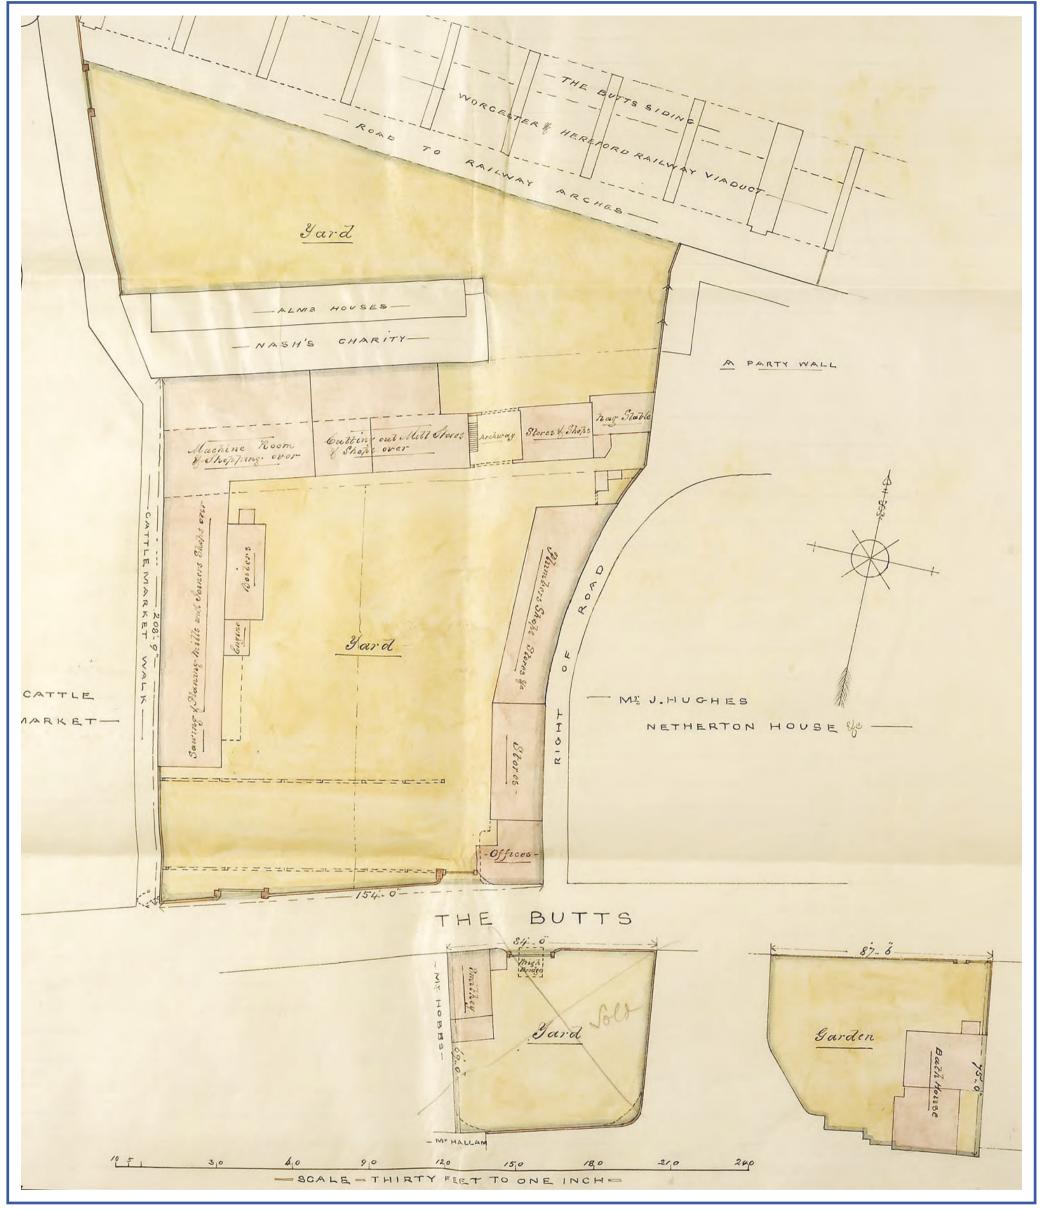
Worcester City planning application (WRO ref b496.5 BA10827/9)
